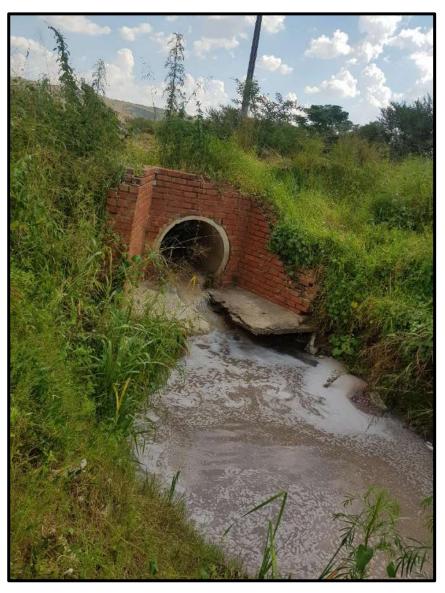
Existing Outlet Structure (1 050mm dia to be reconstructed).
